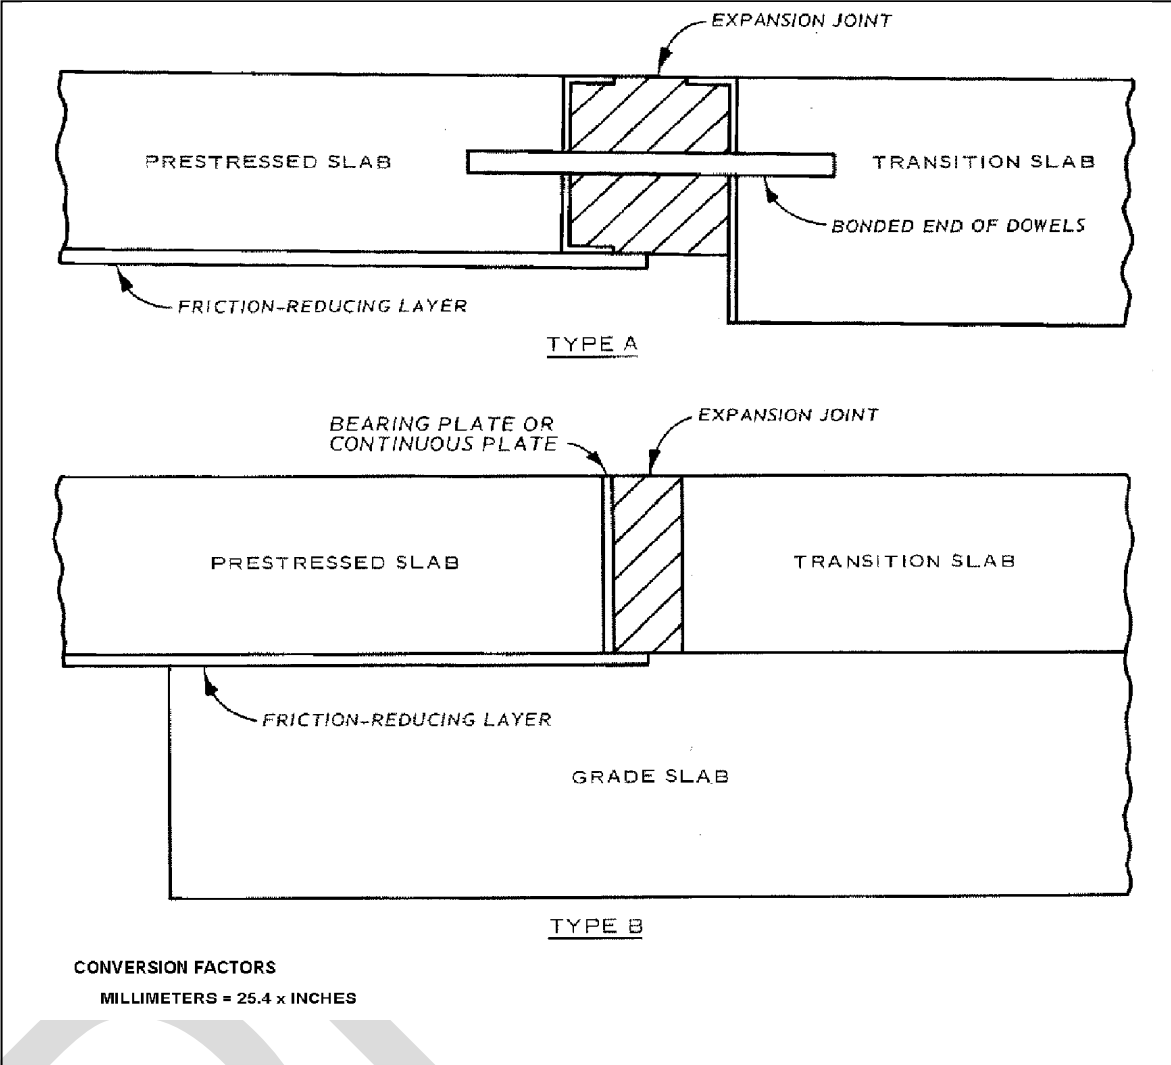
Typical Transverse Joint Seals (Sheet 1 of 3)
